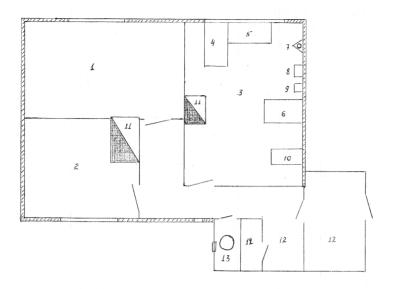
Inside plan of meteorological building (*Source*: AARI archive) (1, 2 – living rooms, 3 – working room; 4, 5, 6 – working table; 7 – barometer; 8 – barograph; 9 – barometer-aneroid; 10 – cupboard with instruments and spare parts; 11 – stove; 12 – storage facilities; 13 – toilet shower).
